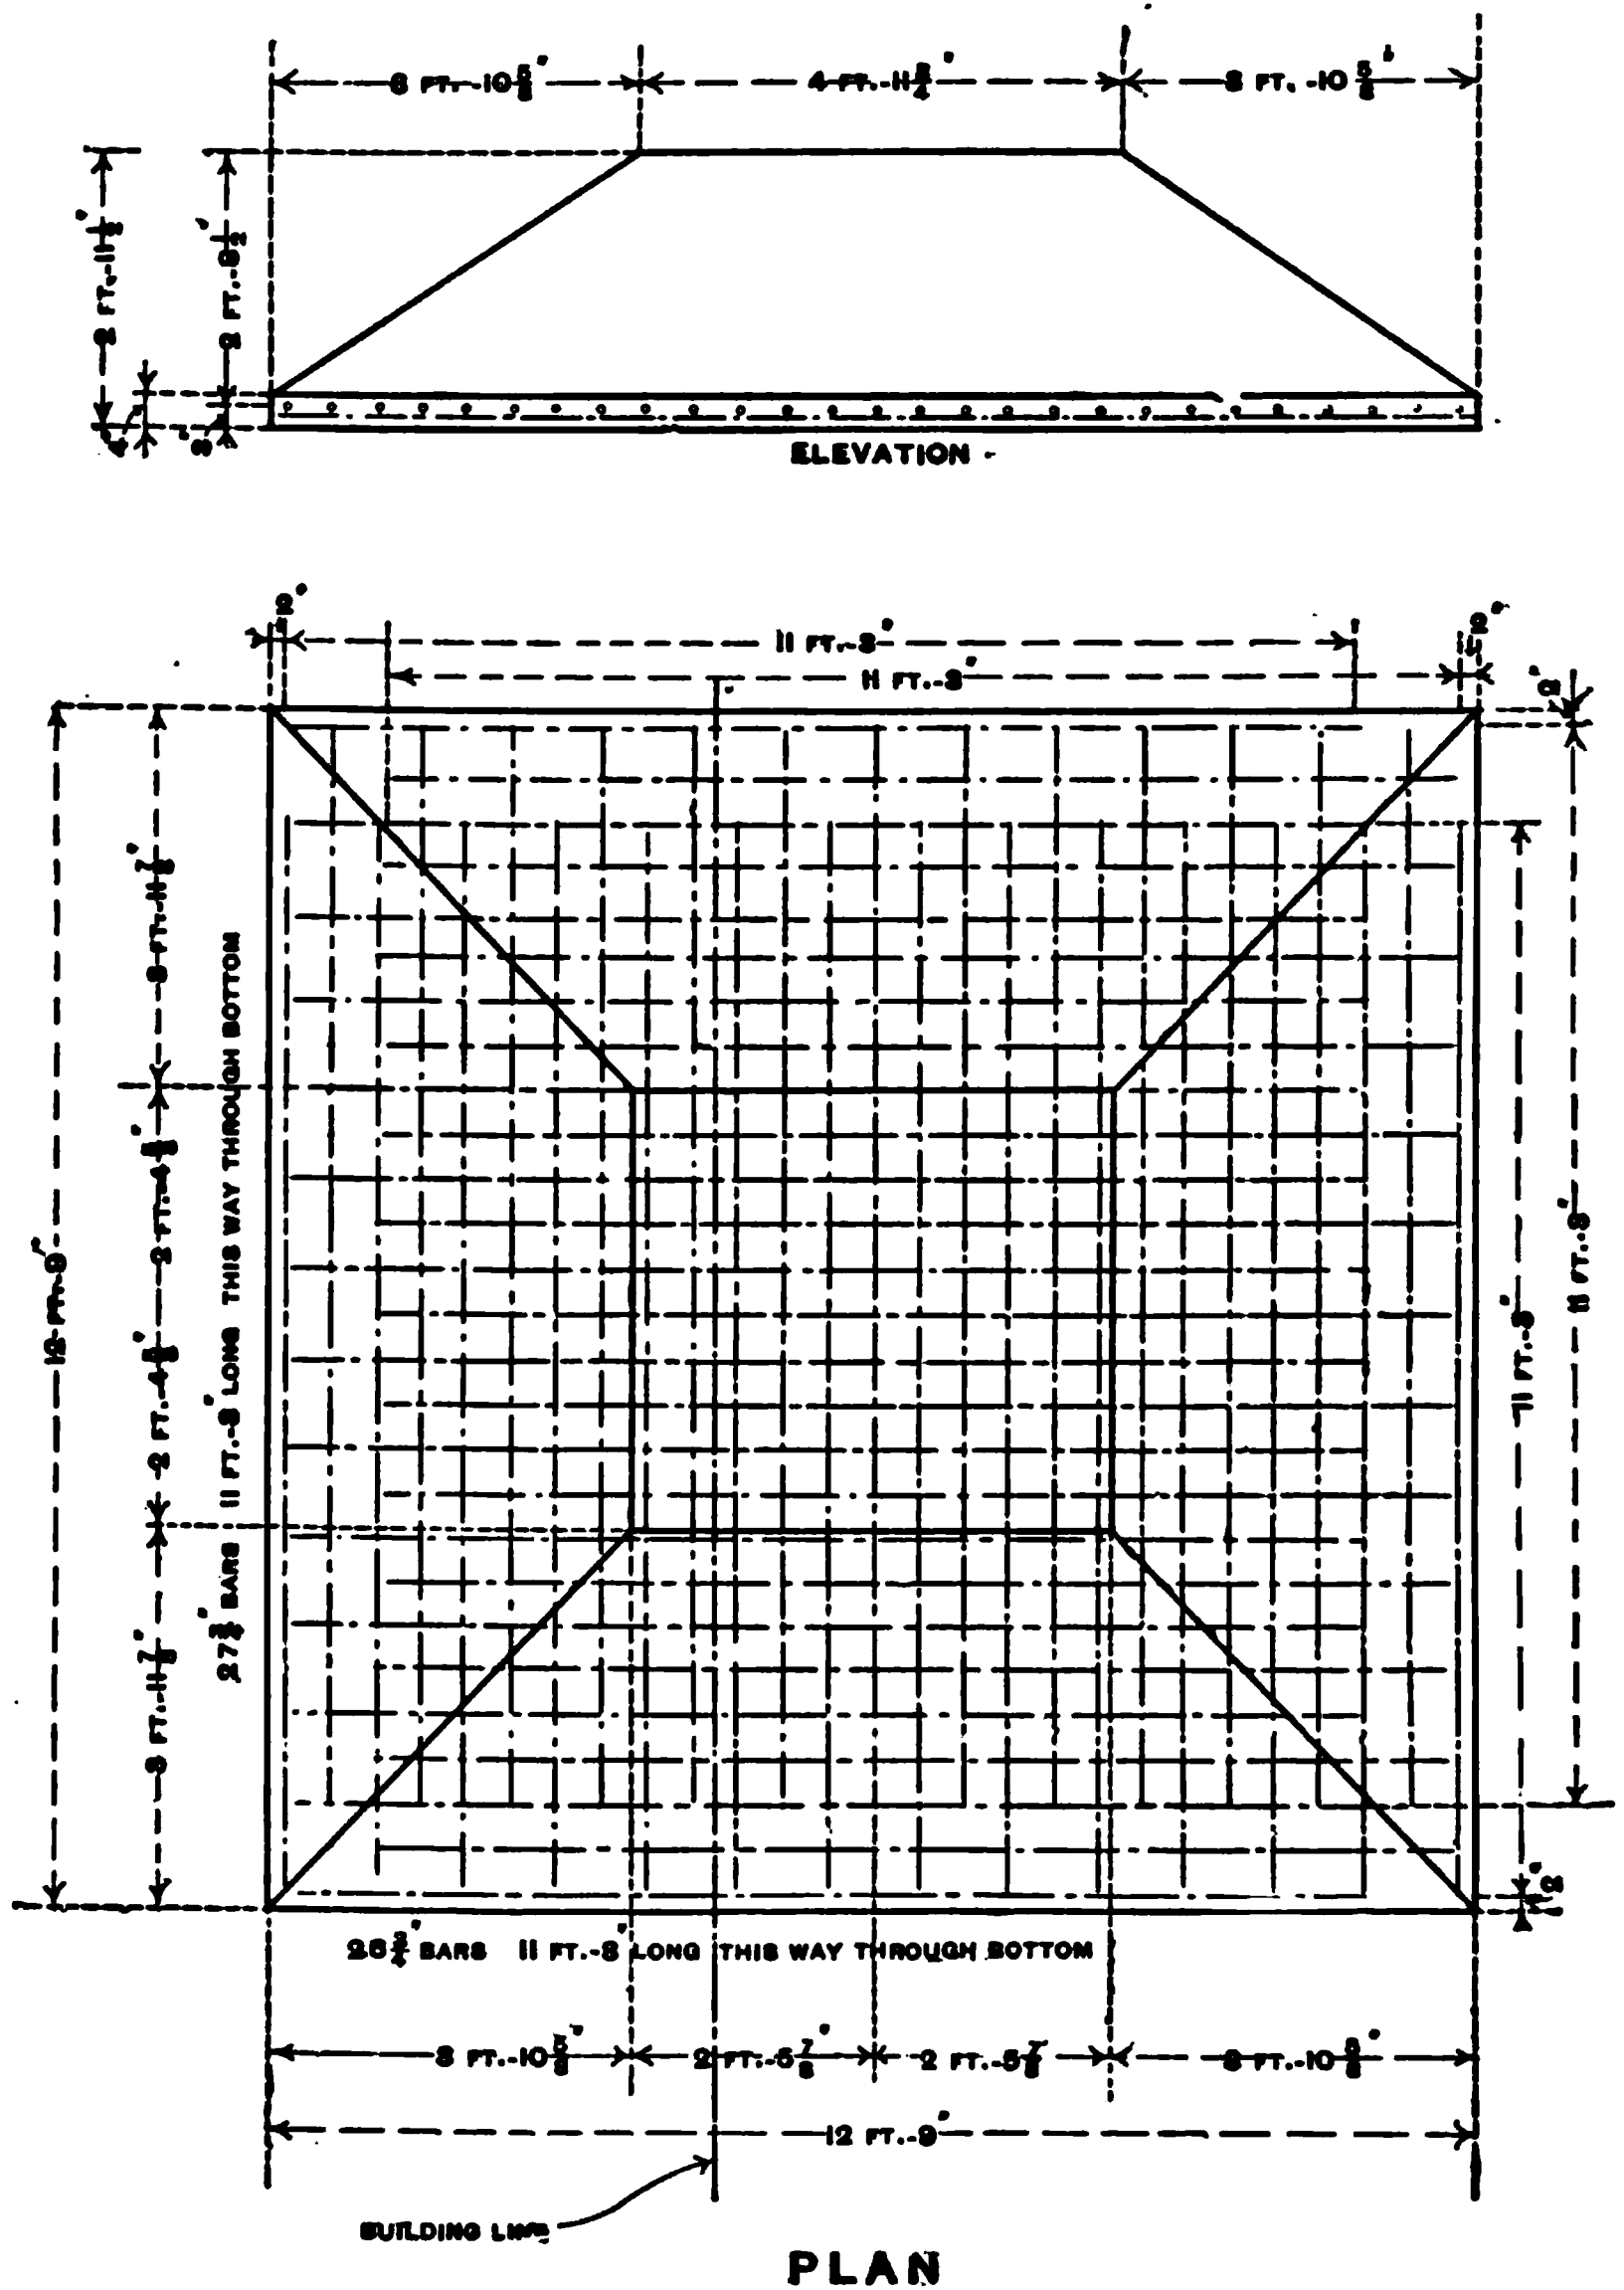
Typical Column Footing in Ingalls Building. (See p. 477.)
